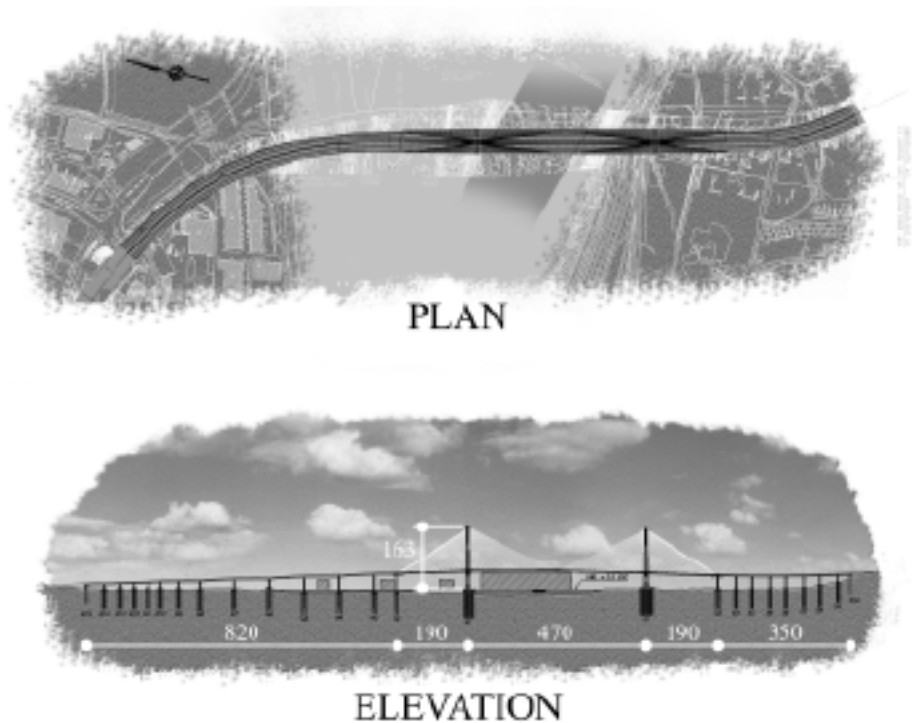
NEW PORT MANN BRIDGE LAYOUT
